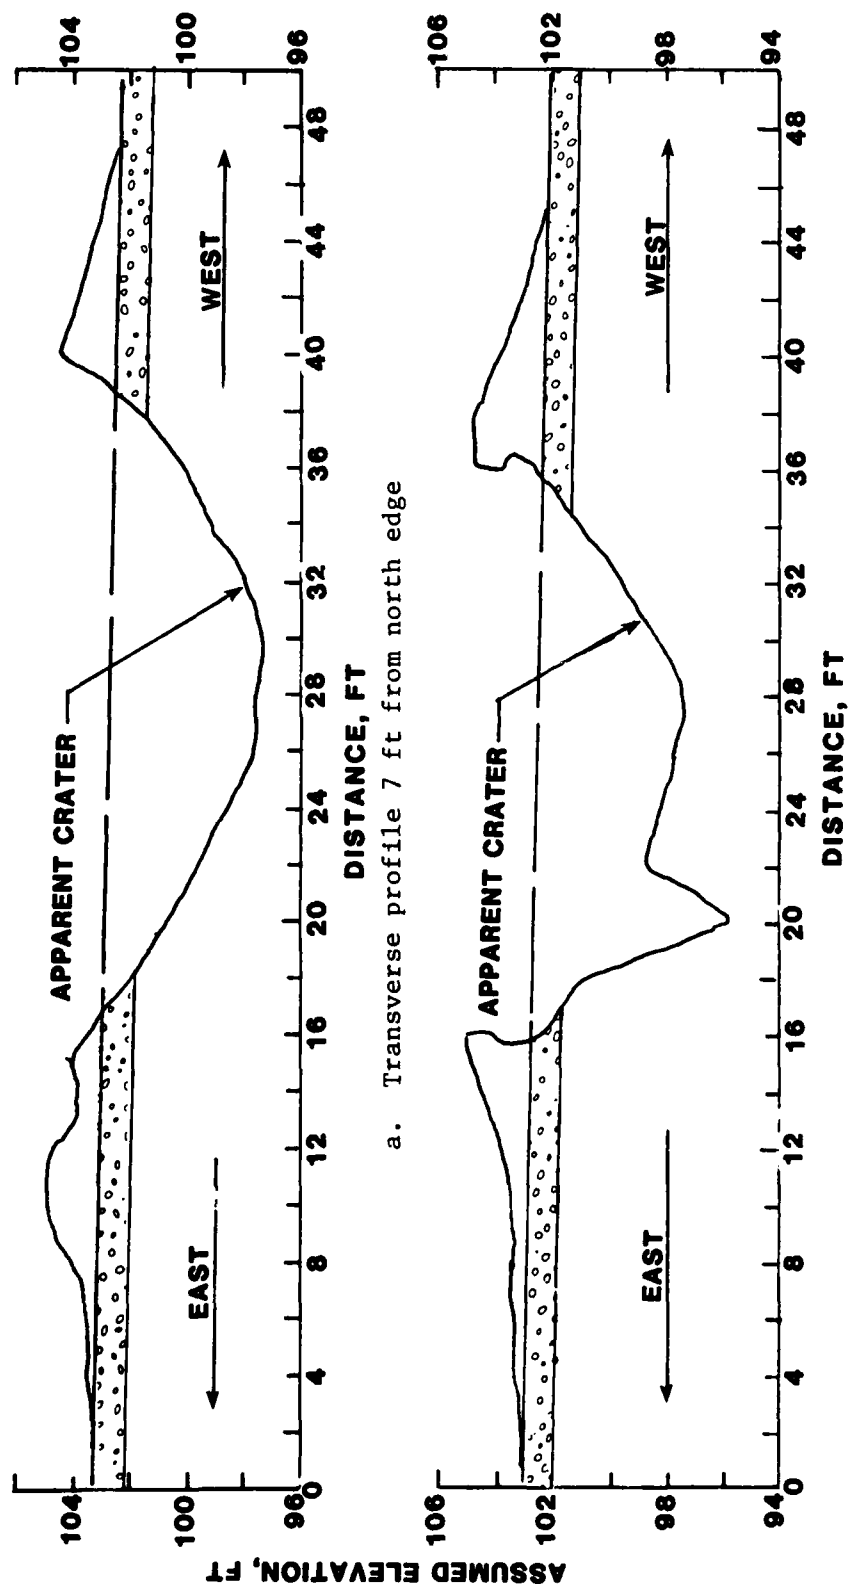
Cross-sectional (XS) profiles for ditch 6RC3, from double-pipe detonation 5 ft below 12-in. pavement. Roadway runs east-west
